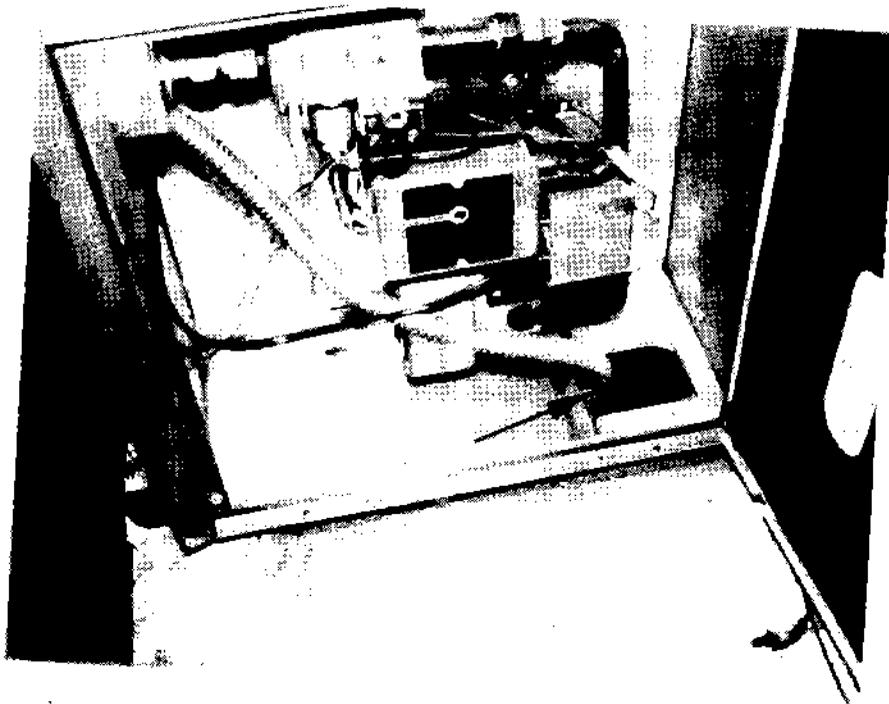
Flexible Gas Connector on Furnace Through Floor to Gas Supply Piping
